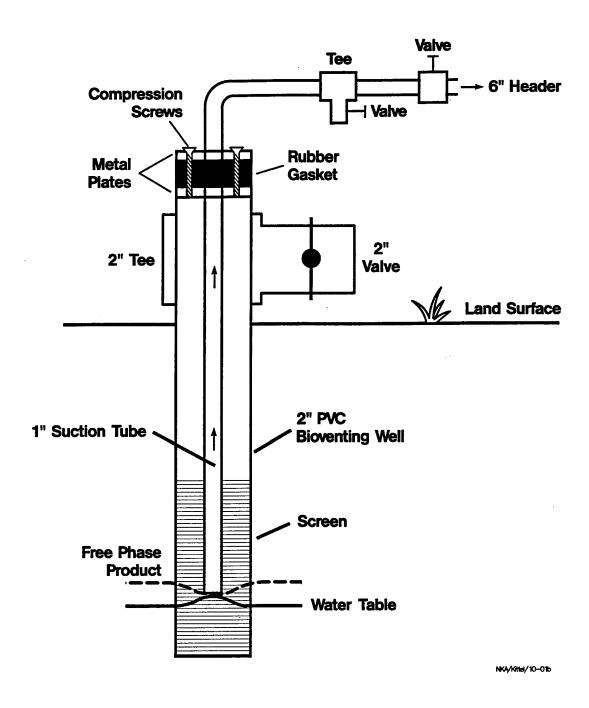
Slurper Tube Placement and Valve Position for the Bioslurper Pump Test
